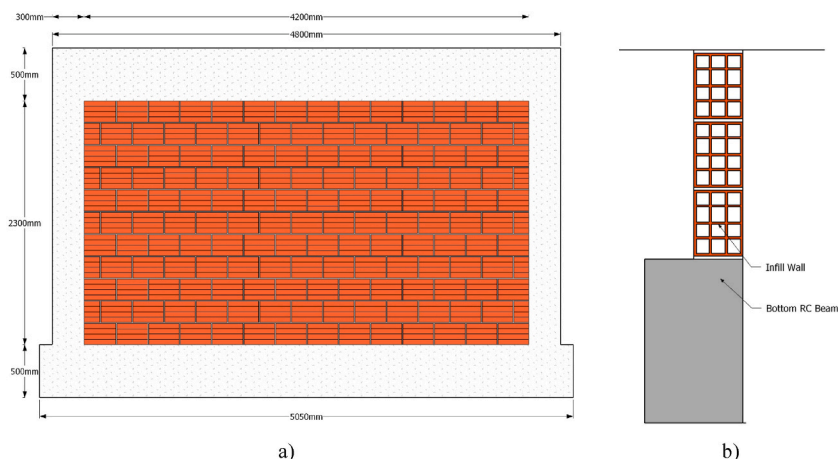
Infilled RC frame specimen dimensions (units in millimetres): a) geometric dimensions; b) construction detail of the masonry infill walls.
